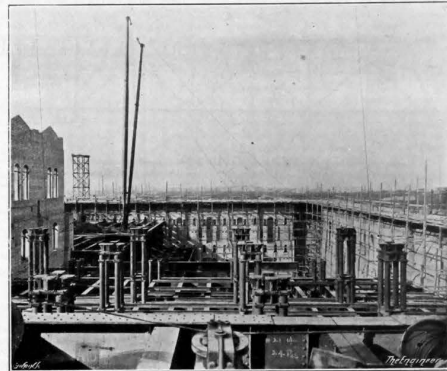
DEVOTO RESERVOIR—COLUMNS AND GIRDERS UP TO FIRST FLOOR
